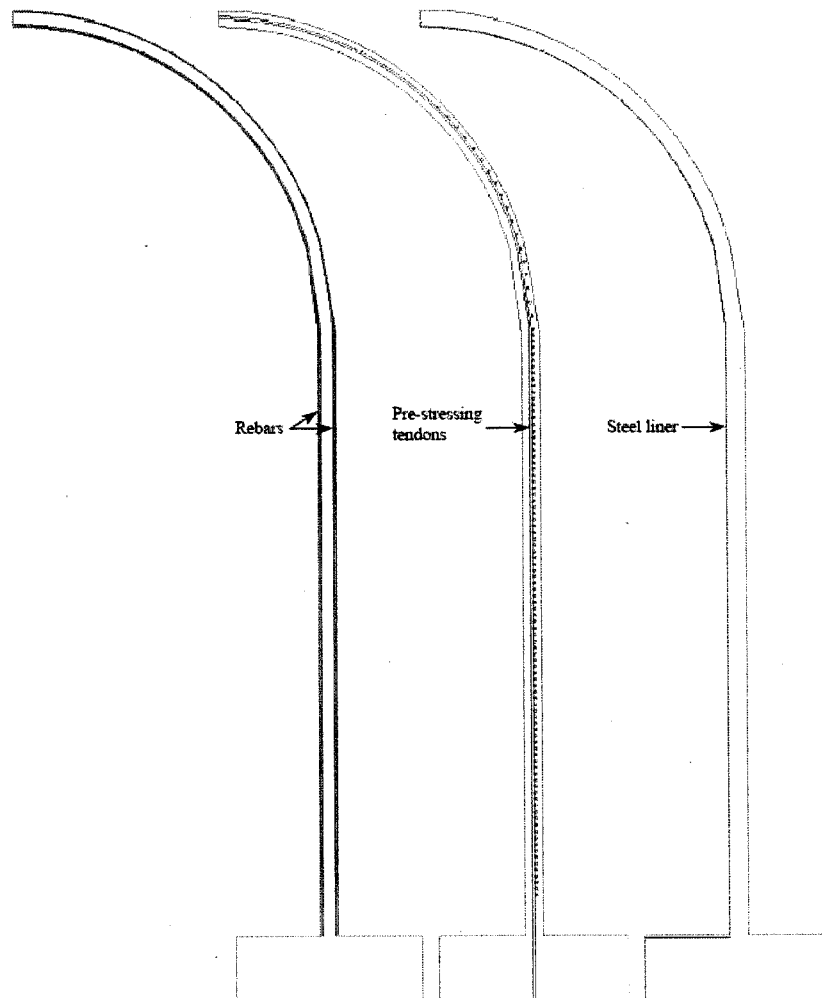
Positions of rebar, pre-stressing tendons and steel liner.
